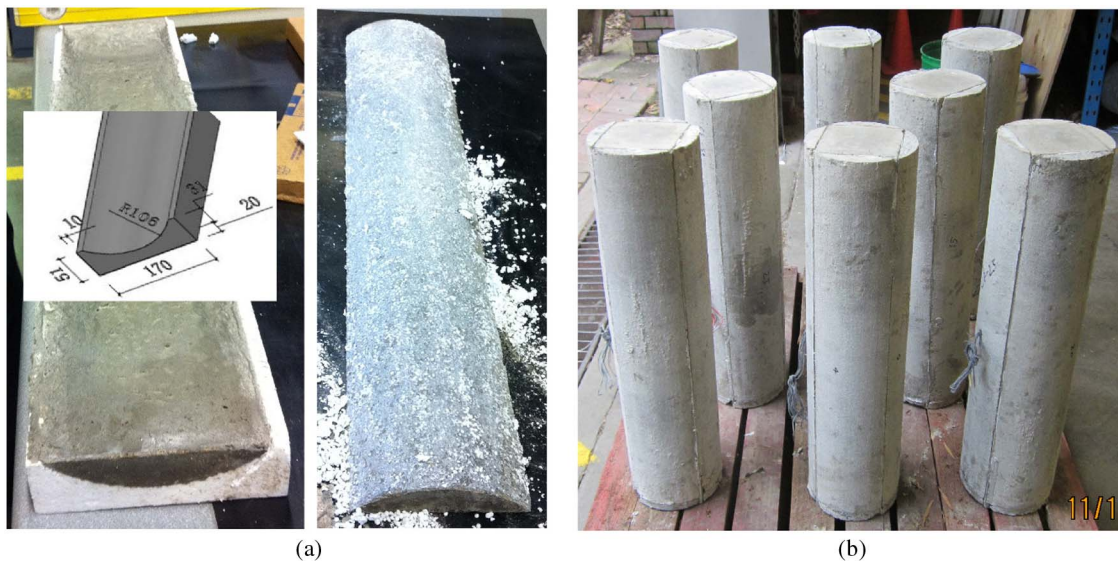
Segmental circular concrete covers and modified section columns: (a) concrete covers and (b) bonded specimens
